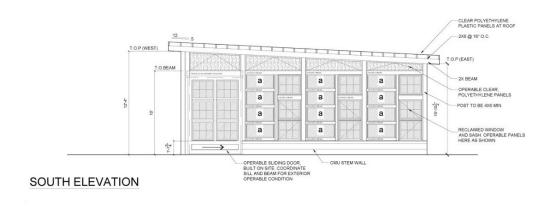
Architectural Drawings of the E. 34 Greenhouse c/o Emergent Structures
